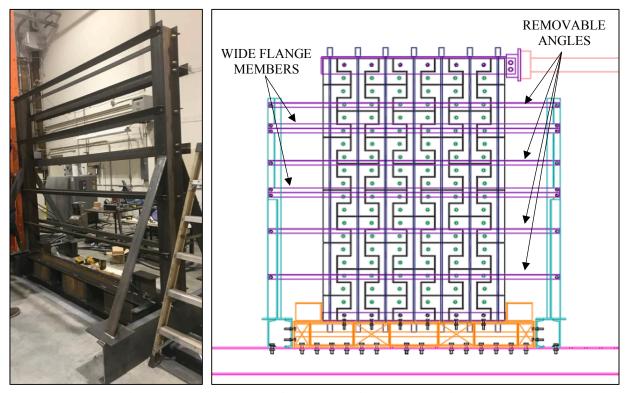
Photograph of steel base and bracing system for specimen (left); Elevation plan for wall and support system (right).
